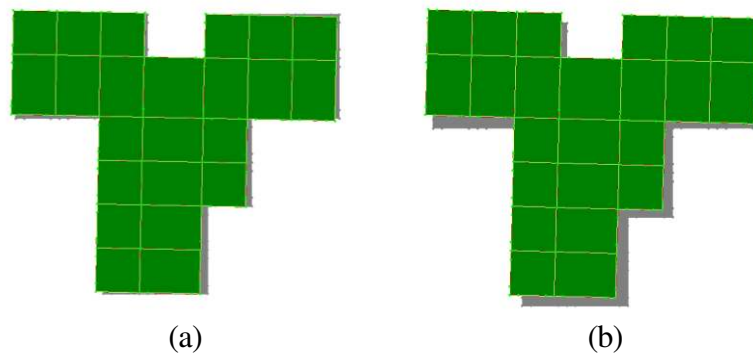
Plan deformed shape corresponding to the sliding shear failure, (a) without and (b) with dowel action contribution
